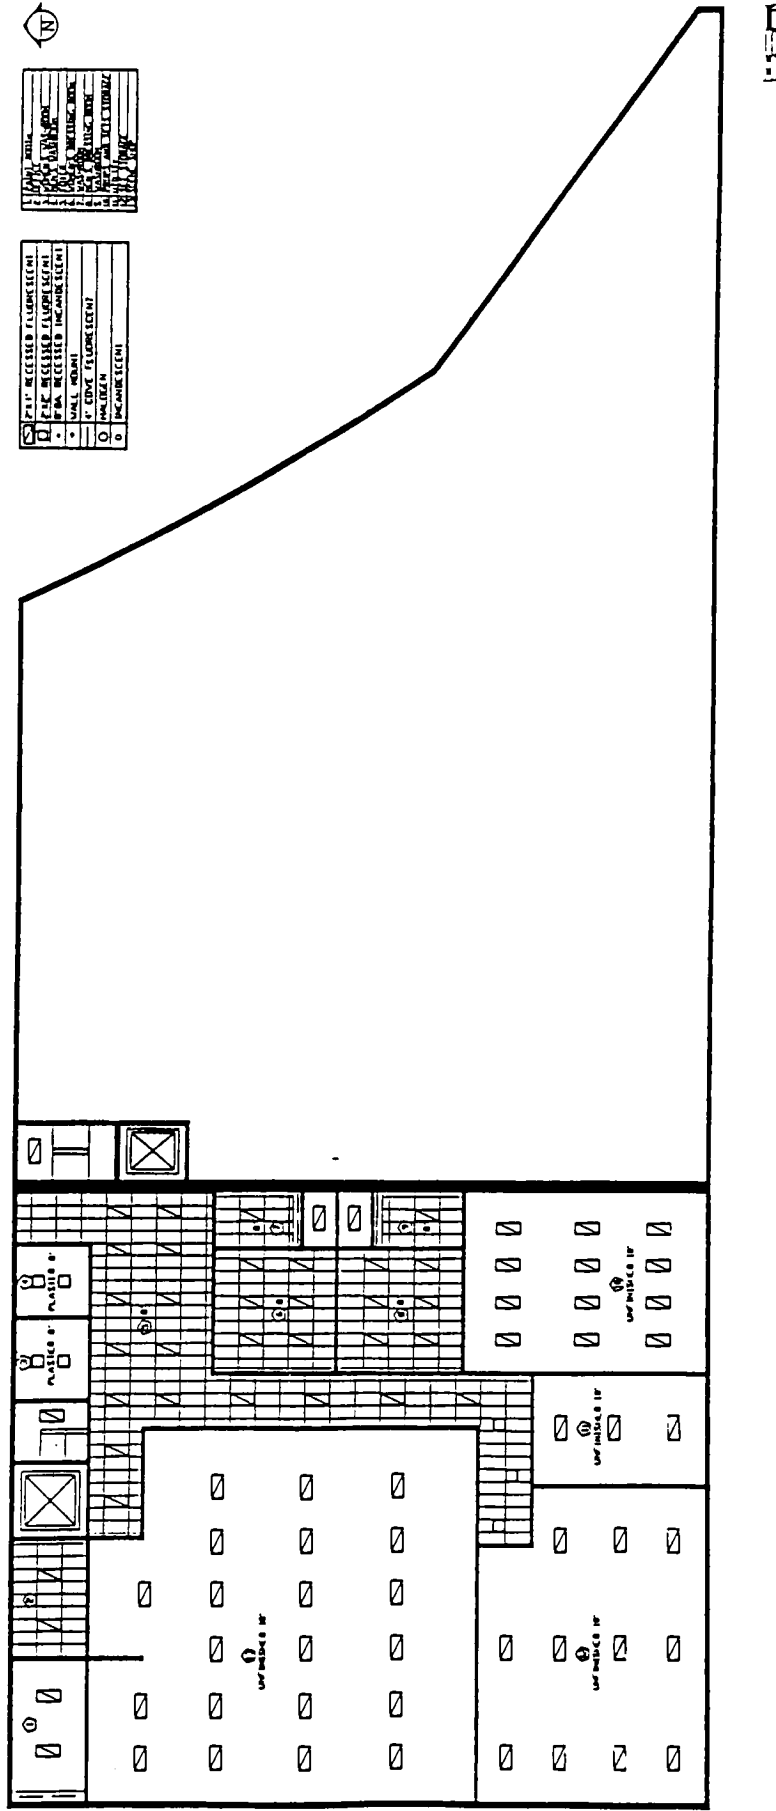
; Reflected Ceiling Plan of Caldwell Theater Complex Basement
